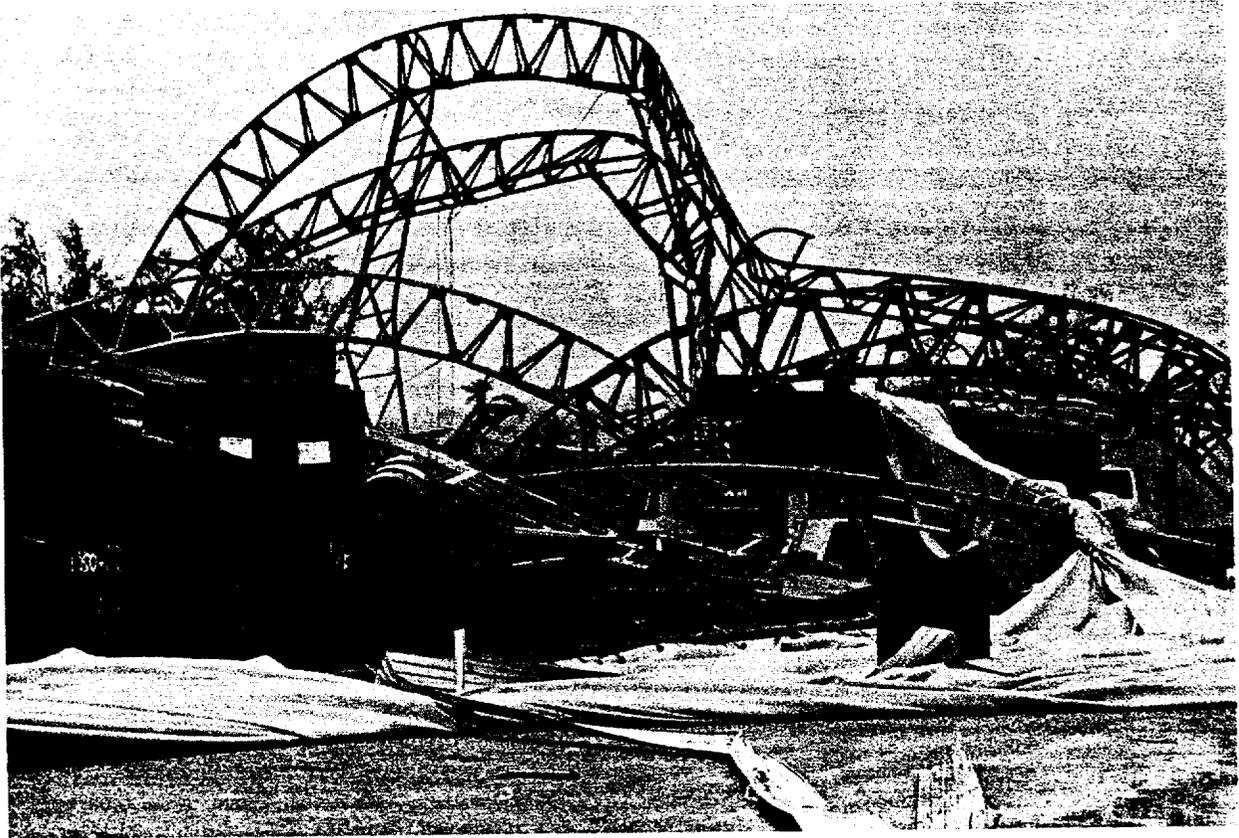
The steel girders of this temporary warehouse on Naval Station, Guam were twisted by the high winds and collapsed during Russ' passage.
